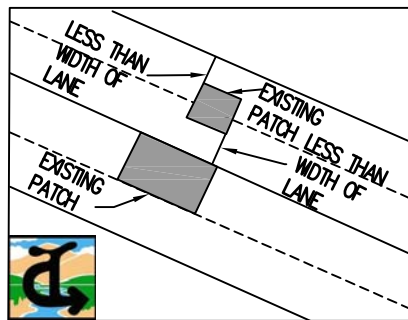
Example 4: In concrete pavements, remove sections to existing joints.
